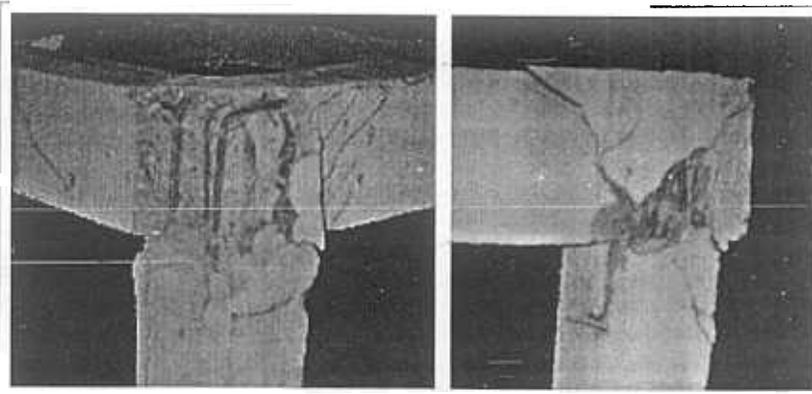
Spalling of concrete and damage to beam-column joints of the non-seismic frame
